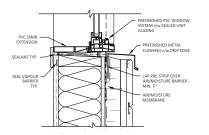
TYPICALWINDOW SILL DETAIL WITH CEMENT BOARD SIDING
